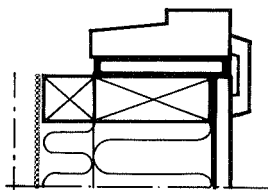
Joint between window frame and wall in places where the inner edge of the frame is flush with the inner edge of the wall. A special window lining is required.
